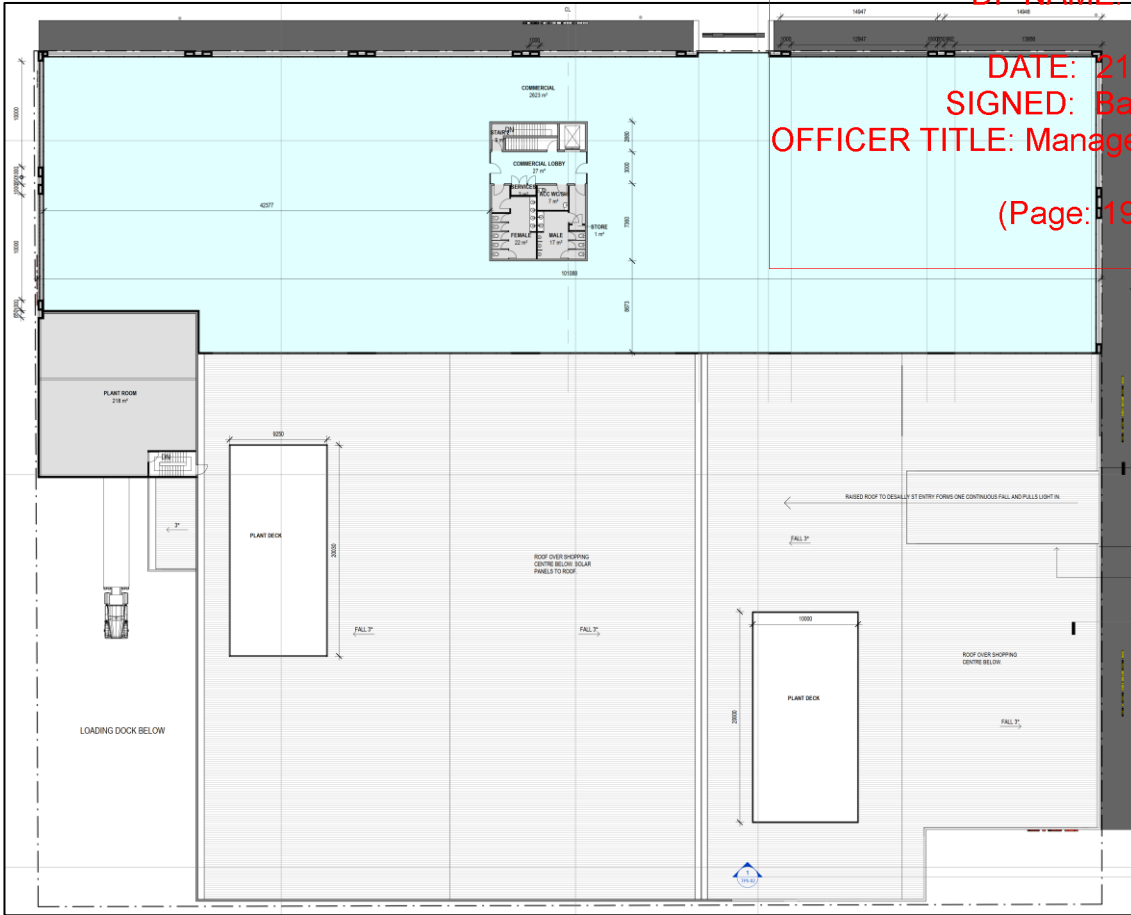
First Floor - Development Plan excerpt (Source: ThextonSmith)
